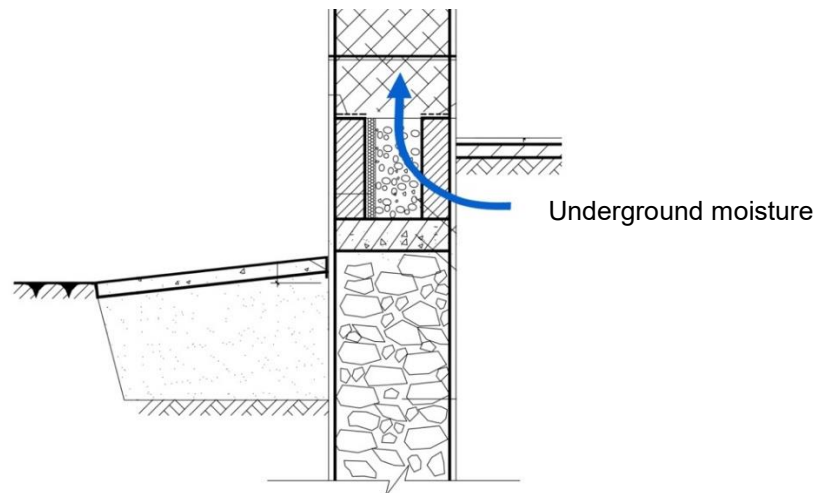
Potential ground damp damage routine (blue arrow) of foundation design of ADRA project.
